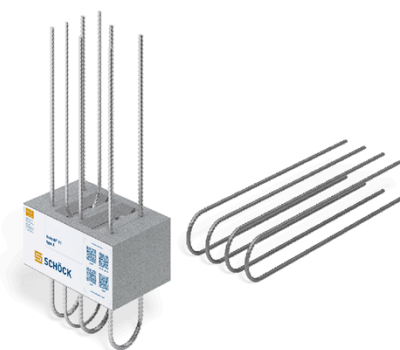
Schöck Isokorb® Type A for parapets and attics
